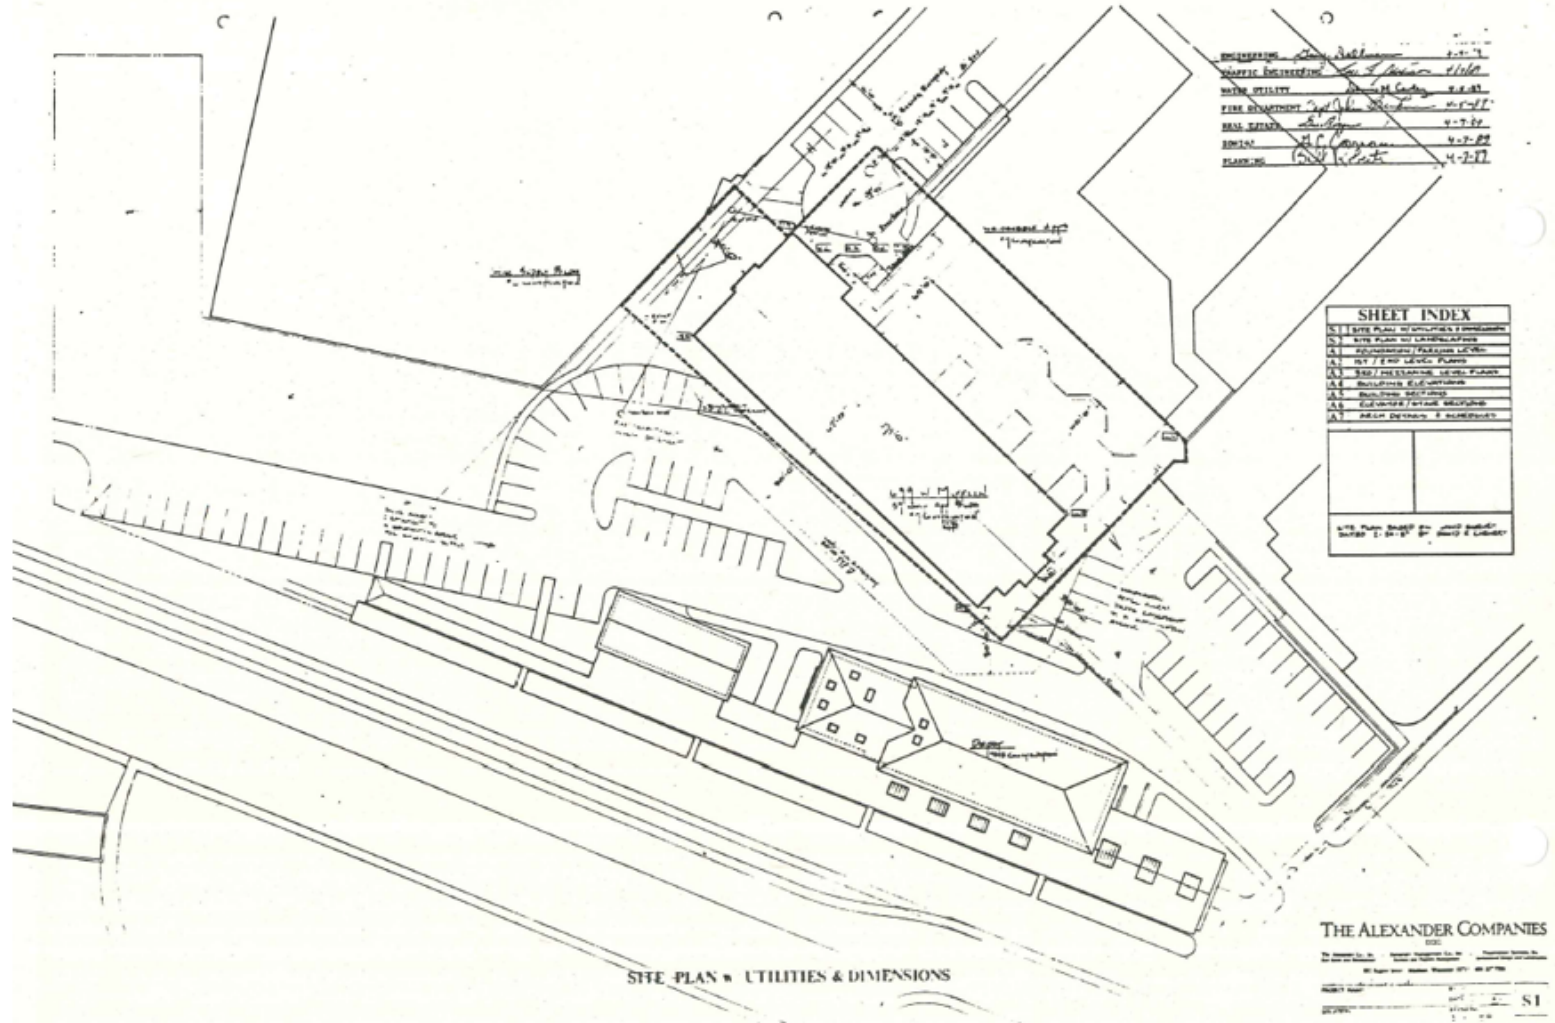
April 1989 site plan for proposed Planned Development. While the site plan shows the Wiedenbeck-Dobelin warehouse and its mirrored new building at 619 W Mifflin on a separate lot from the new building at 699 W Mifflin and its structured parking with outside courtyard, the current configuration has the property boundary for 619 W Mifflin including the courtyard between it and 699 W Mifflin. City of Madison Building Inspection Files, Madison, WI.
